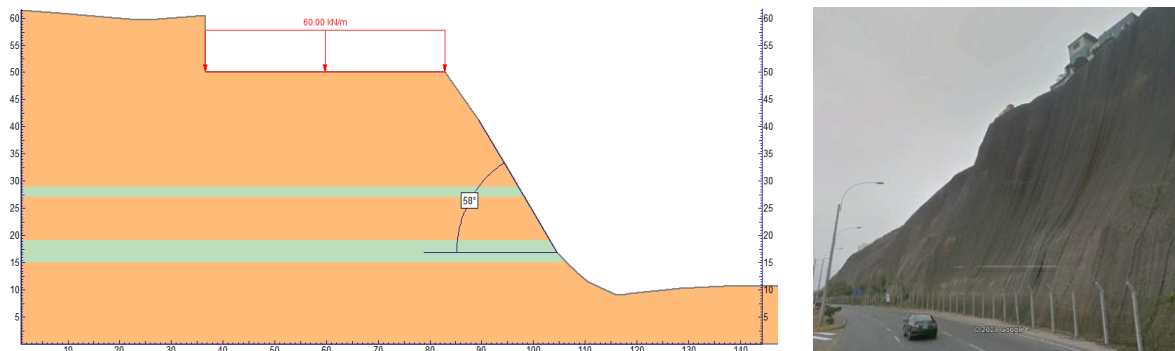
Cross-section of P-04 for slope stability analysis (left). Real view on site (right)
